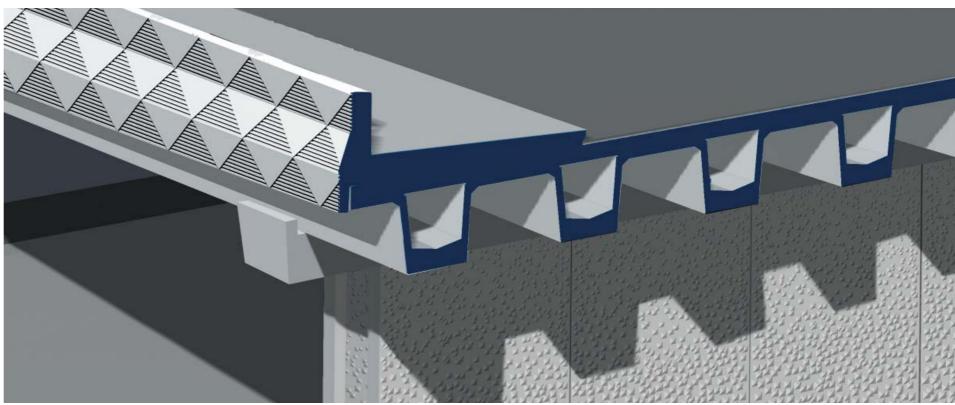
Great South Road trailing edge barrier showing geologic rusticated central pier
